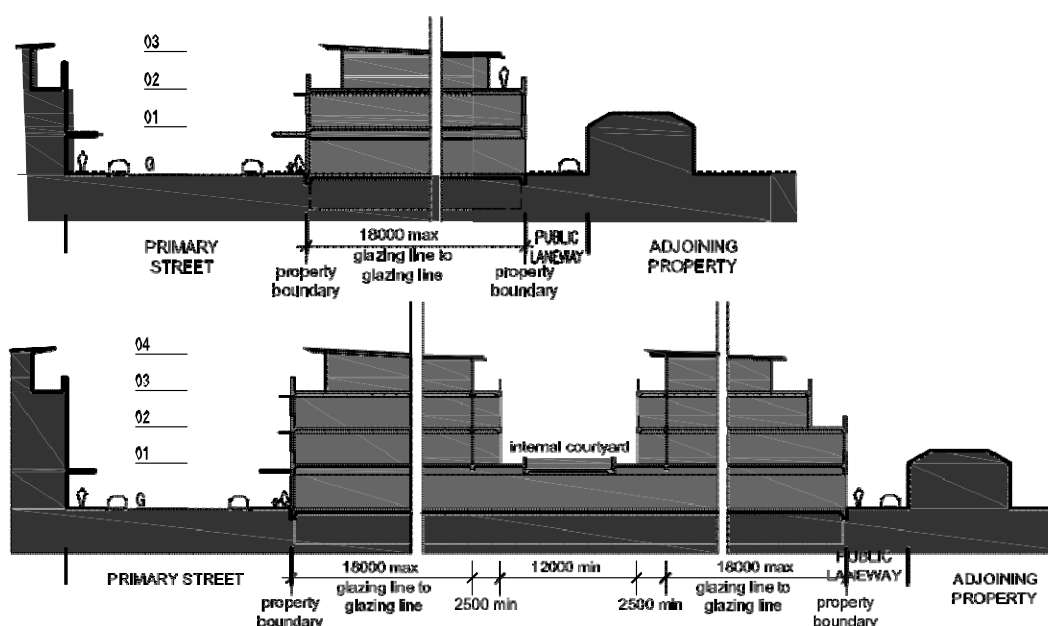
Waverley Development Control Plan 2012 - Annexure E 3-1 - examples of typical building section dual street frontage.
